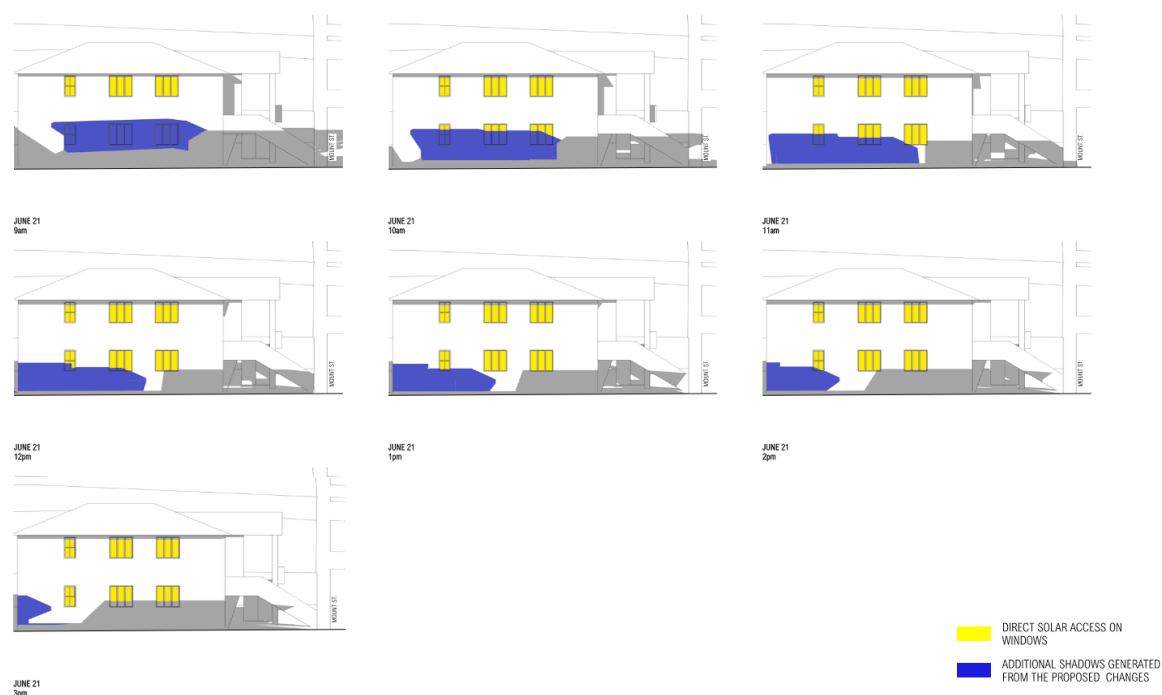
North elevational shadow diagrams for 9 Mount Street, Coogee
